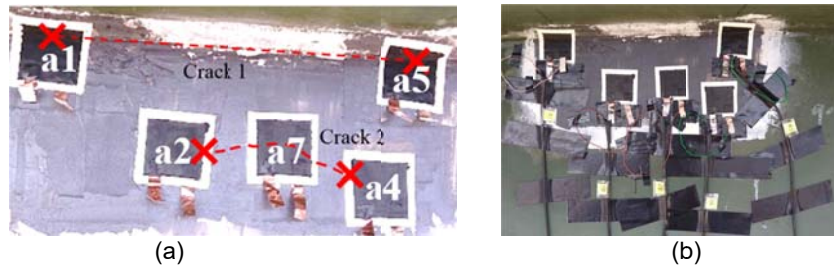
(a) Arrangement of the SEC arrays; and (b) the SEC arrays after soldering the cables.
